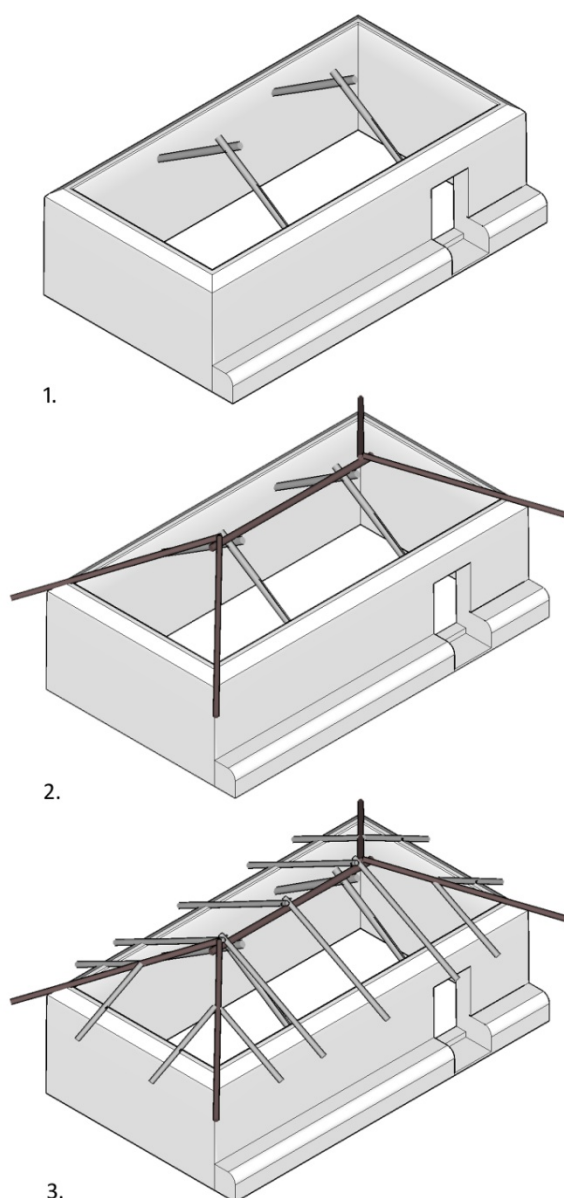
Orak roof with inclined supports for rafters. In stage 2, note the ridge beam supported in the intersection of the two members.
